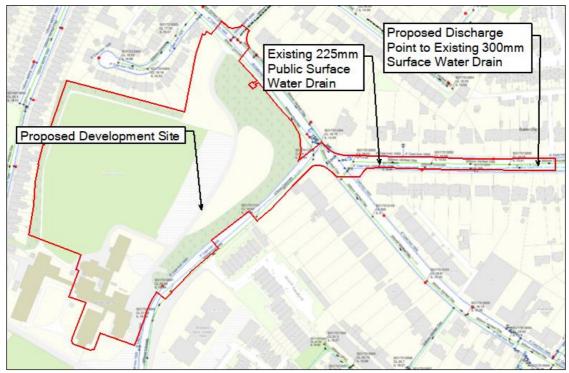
Extract from Irish Water Network Plans – Site Boundary Indicative Only
